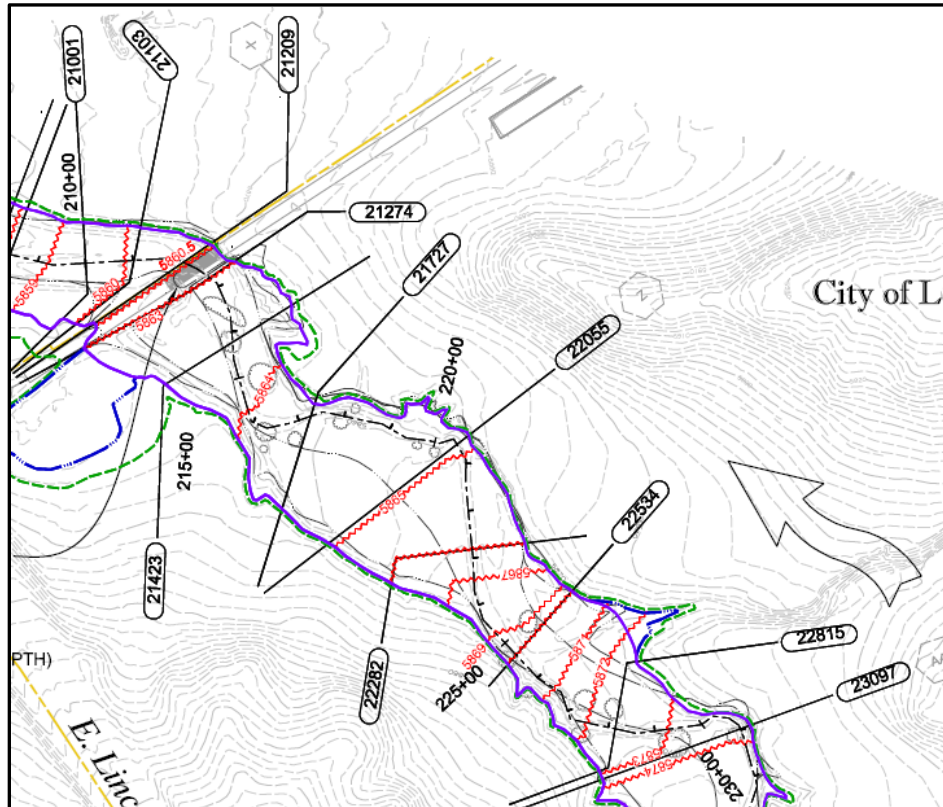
Example of HEC-RAS cross section placement and alignment
